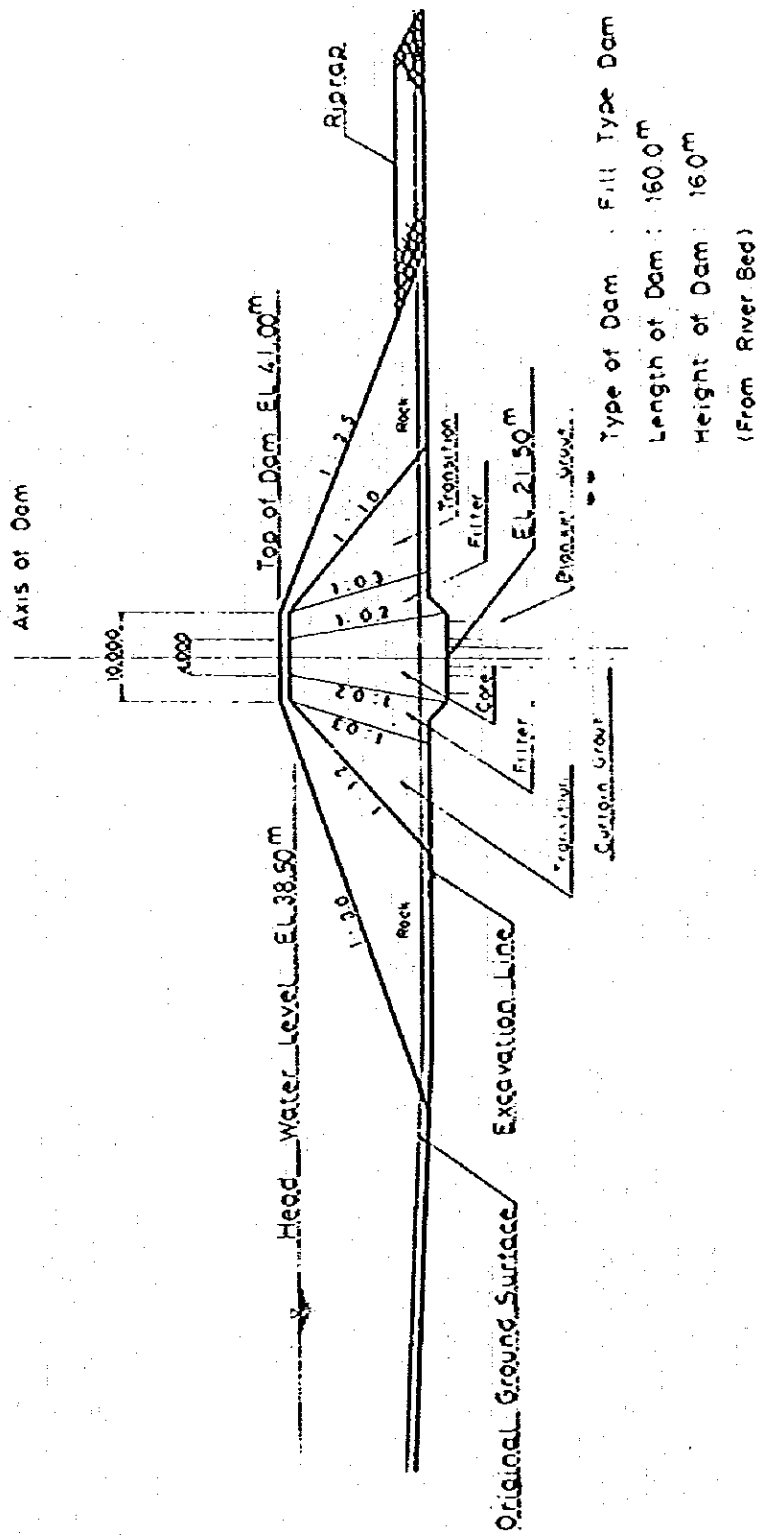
TYPICAL CROSS SECTION OF DAM
